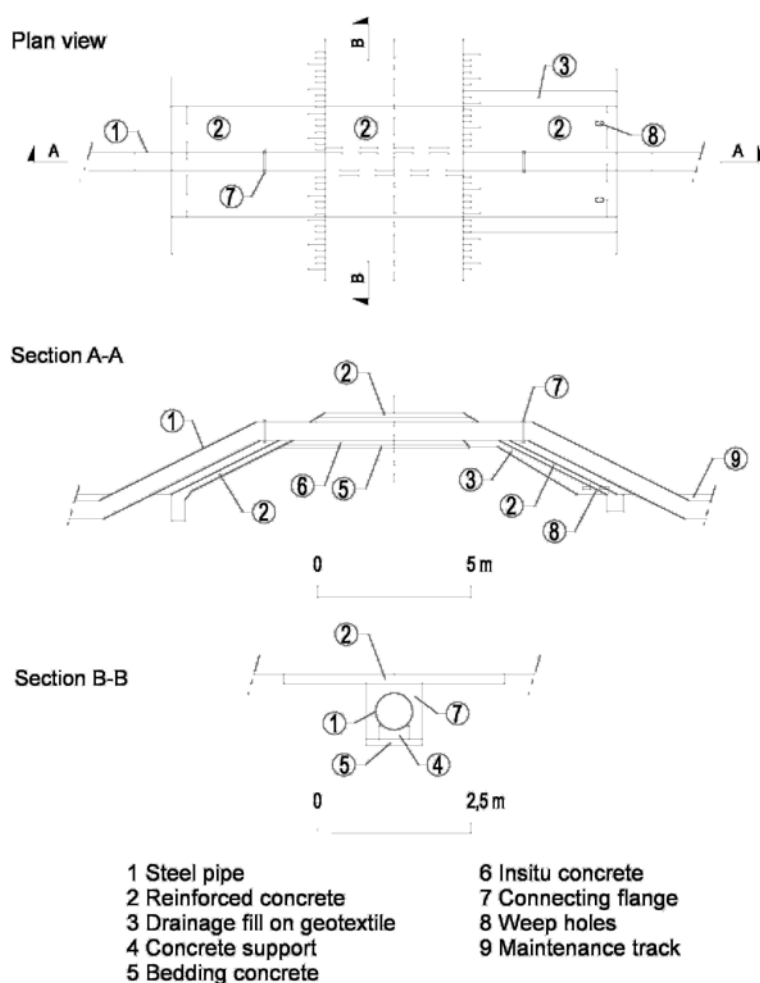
Cross-section showing the detail for an inverted siphon crossing a levee (courtesy Symadrem and ISL)
